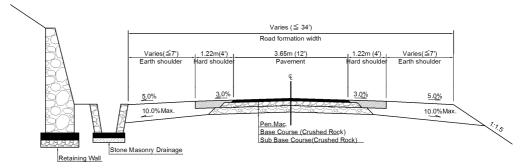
Typical Cross Section with Stone Masonry Retaining Wall and Drainage Source: Prepared by the Preparatory Survey Team
